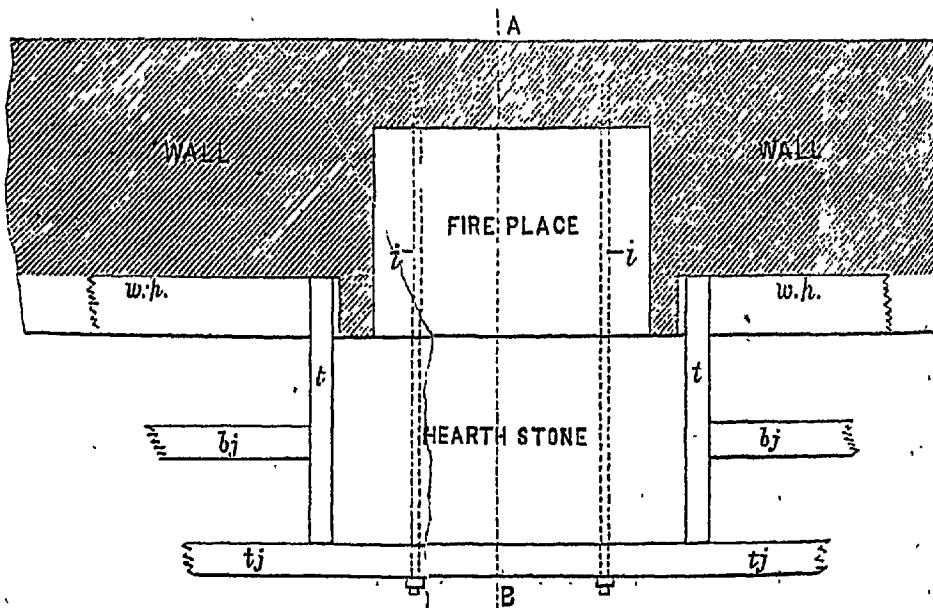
shows in plan the method of trimming the bridging joists so as to avoid a fire-place. bj , bj are the bridging joists; t , t the trimmers; tj the trimming joist; $w.p.$ the wall-plate; i , i , the iron bolts added to resist the thrust of the arch; h the hearth-stone; f , the fire-place; and a , the arch which supports the hearth-stone. Scale = $\frac{1}{20}$.
